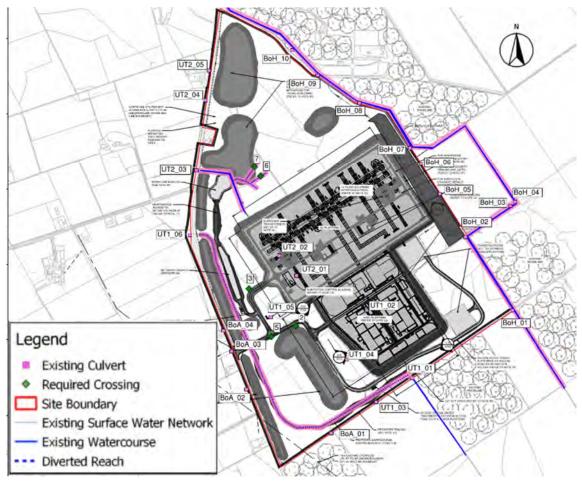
Location Plan Showing the Proposed Permanent Development Overlain with Watercourse Diversion Proposals and Required (and existing) Watercourse Crossings.
